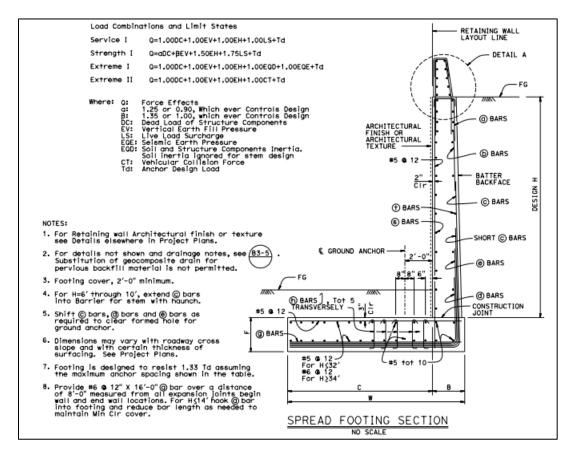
Vertical Ground Anchor Details (from Caltrans XS Sheet No. xs12-030-1)
